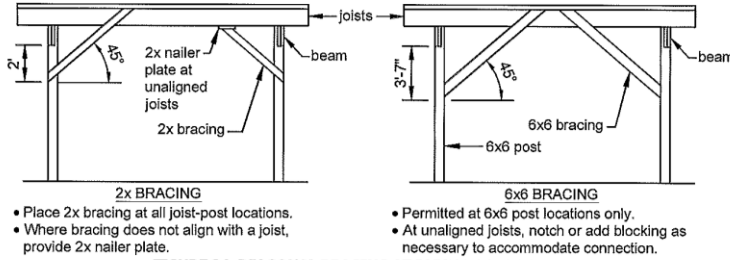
DIAGONAL BRACING AT JOIST-POST LOCATIONS
